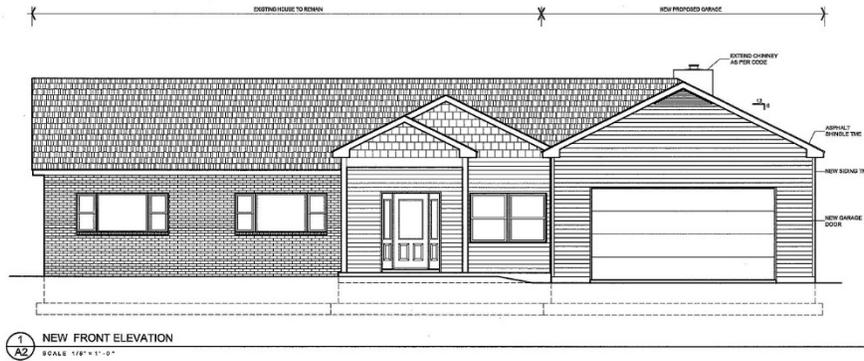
PROPOSED FRONT ELEVATION SOURCE: APPLICANT
